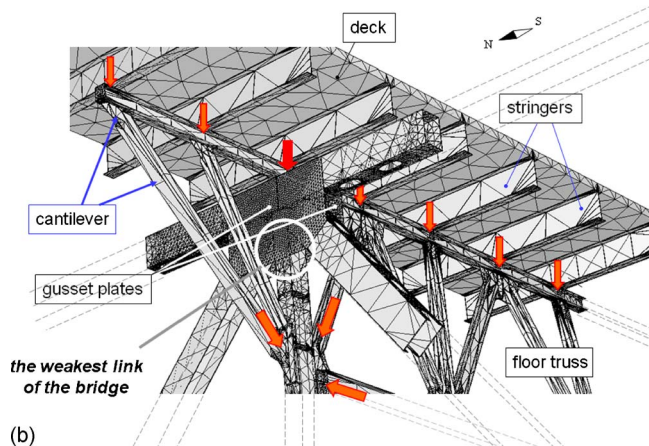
Stresses on the floor truss frames above nodes U10 and U11 under collapse load. The peak stress occurs on the diagonal truss member between the top floor truss and the main truss vertical member, which caused the elevated stress in main frame truss vertical member (see Fig. 6).
